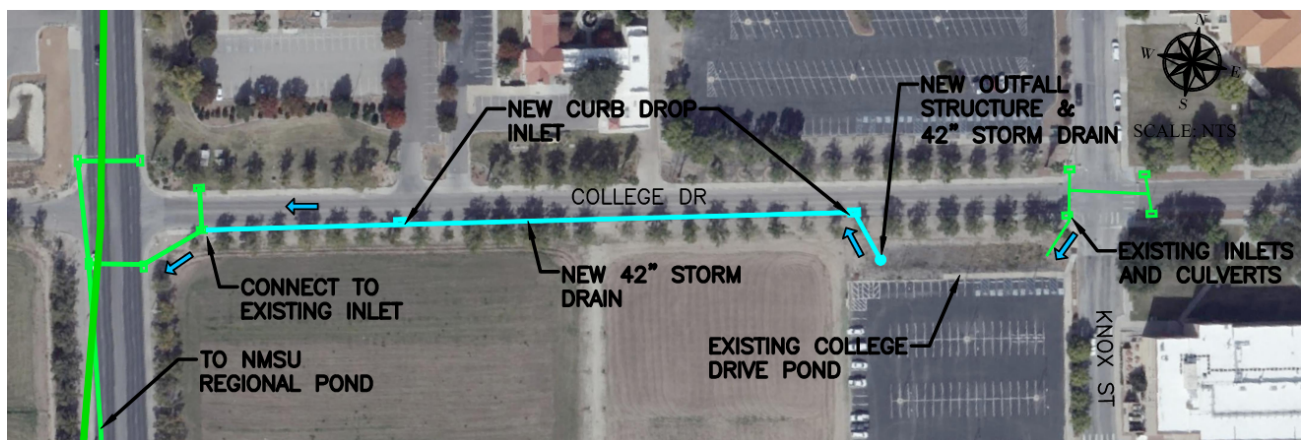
COLLEGE DR STORM DRAIN IMPROVEMENTS
